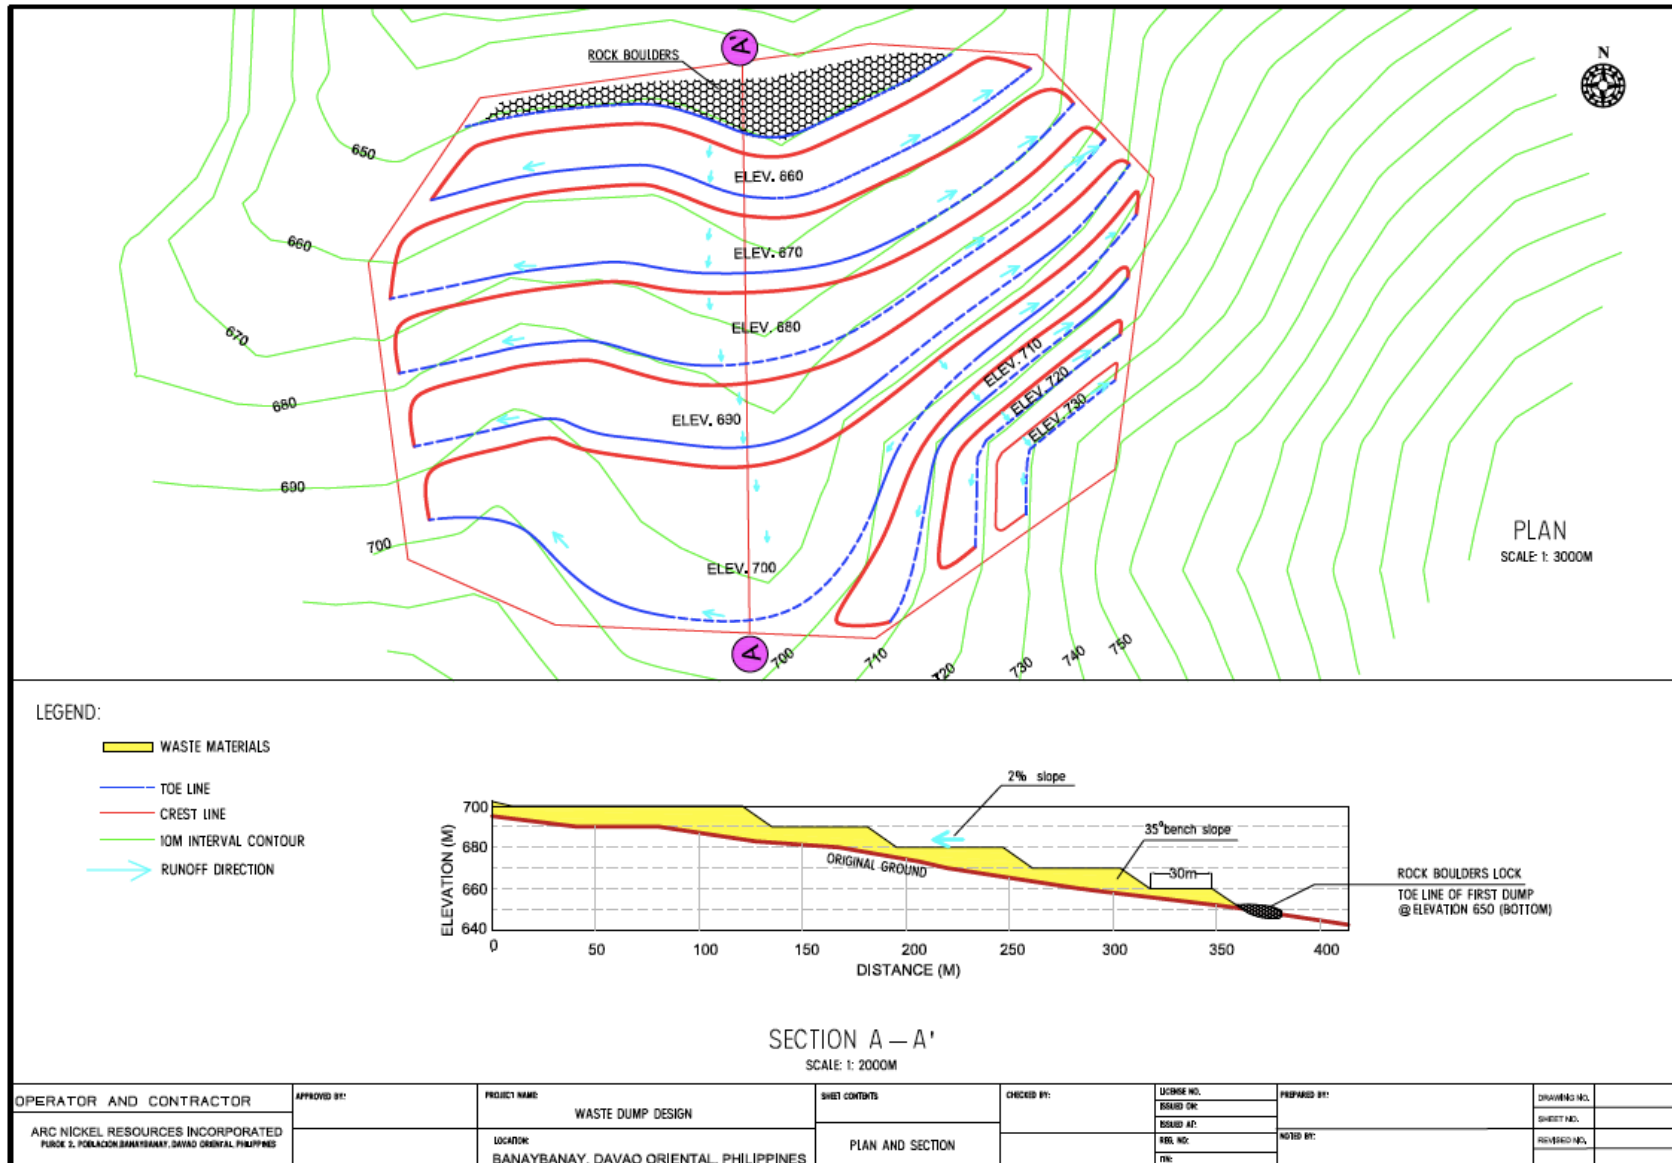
Waste Dump Layout Plan (Source: RCMC)
